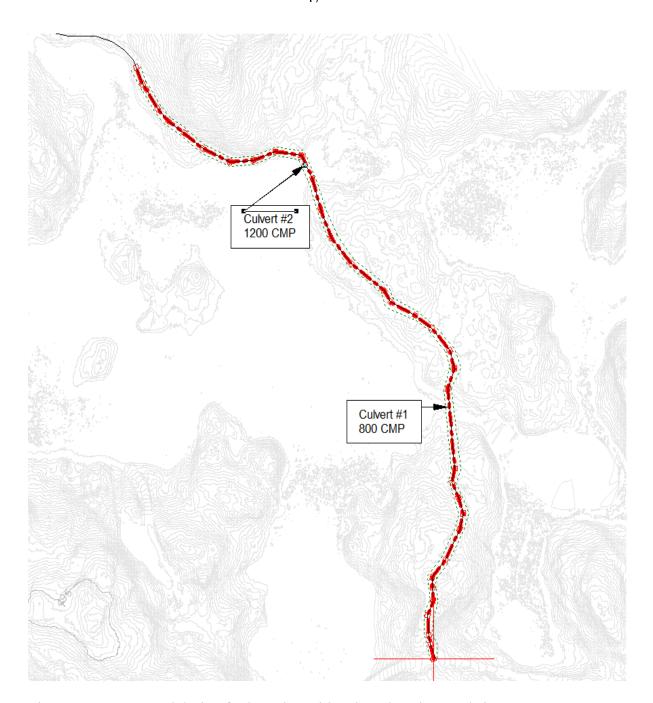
Eacom road design for branch 1 with culvert locations and sizes.
